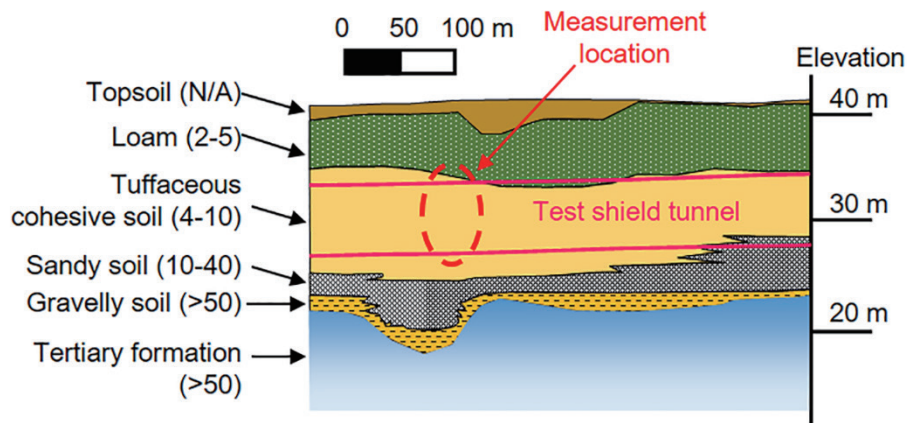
(Color online) Longitudinal section view of shield tunnel and soil profile (units: m).
